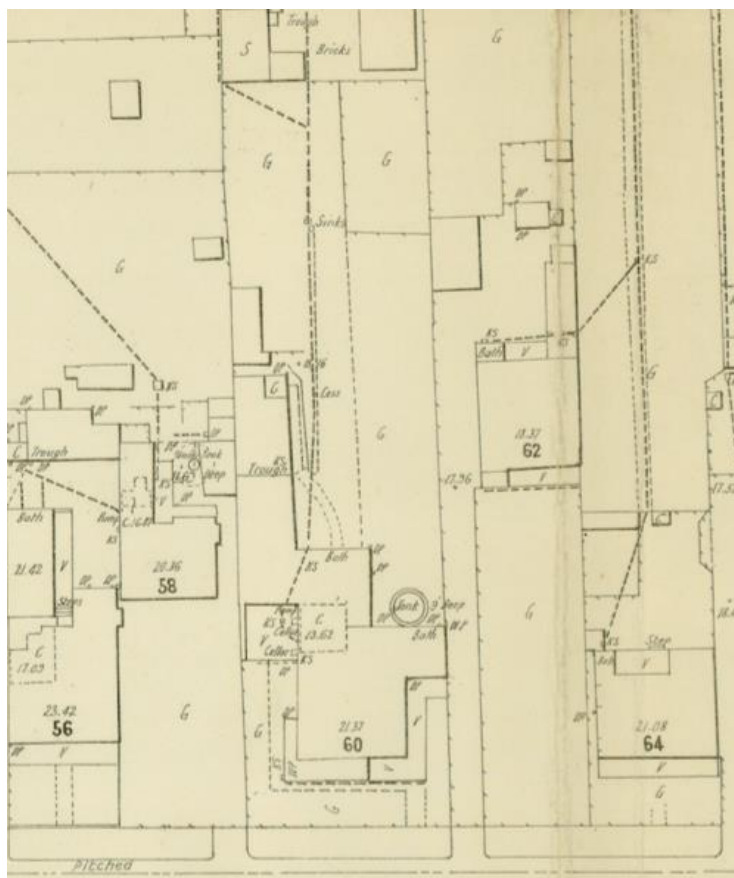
Extract of MMBW Detail Plan 1372 showing the house, by then numbered 60, and rear garden in 1897.
